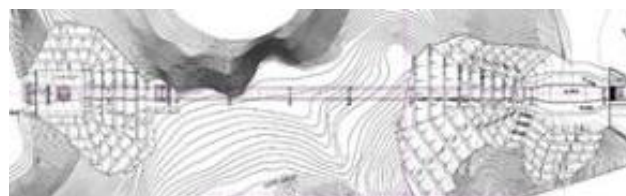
Tunnel plan in two-dimensional Auto cad drawing
